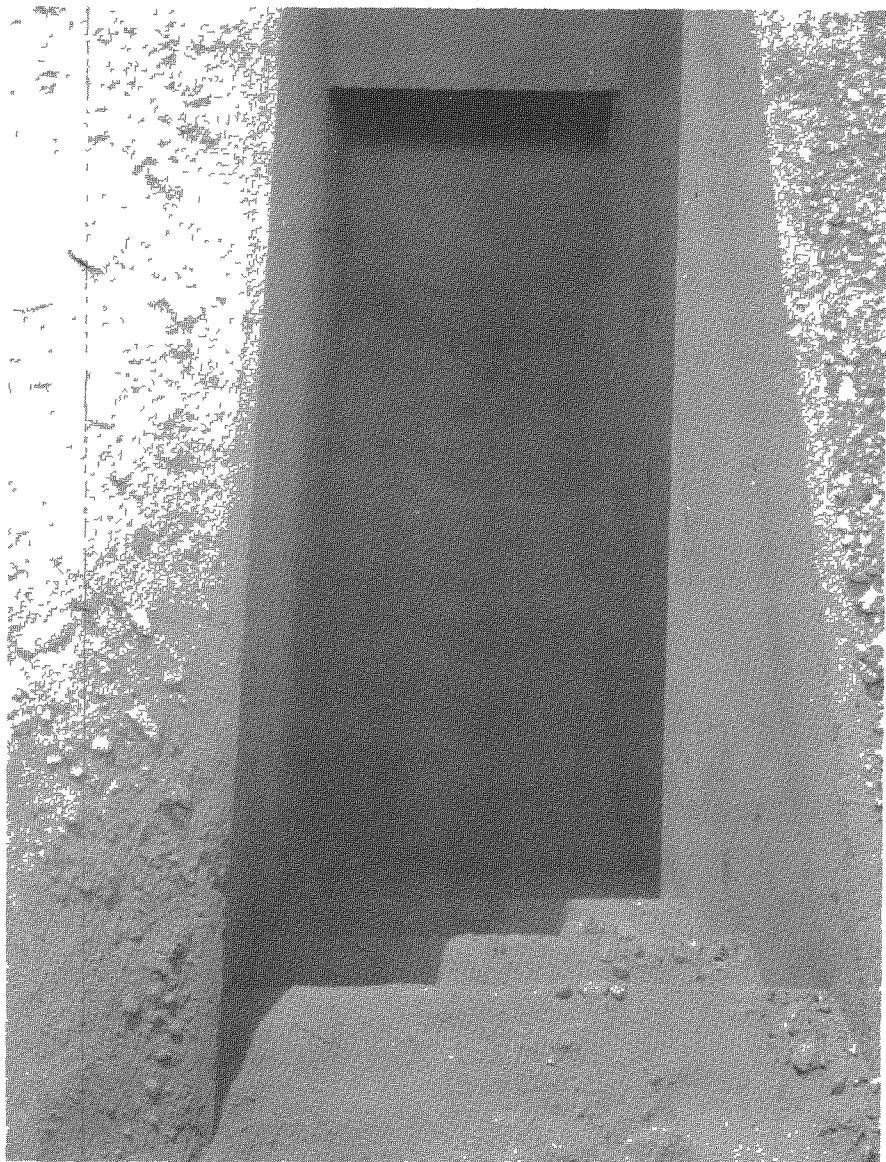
Entrance to reinforced concrete basement exit after blast.
